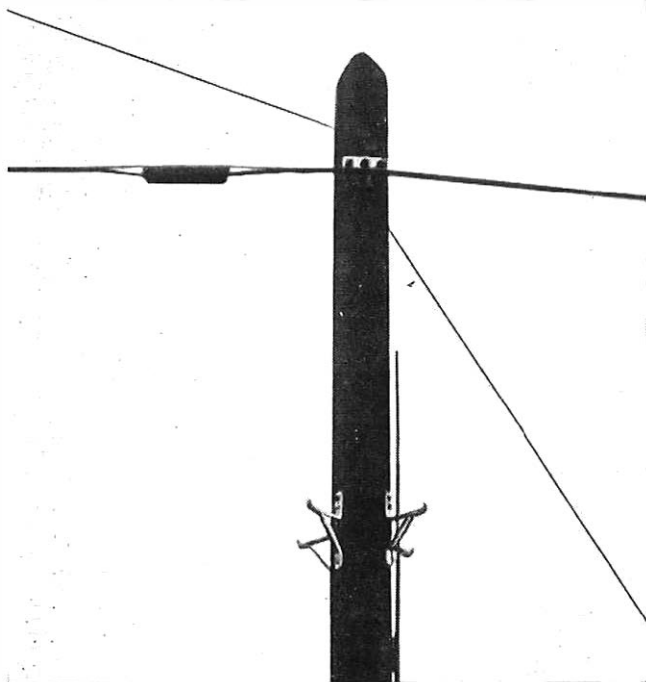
AERIAL-CABLE COUPLING INSTALLED
